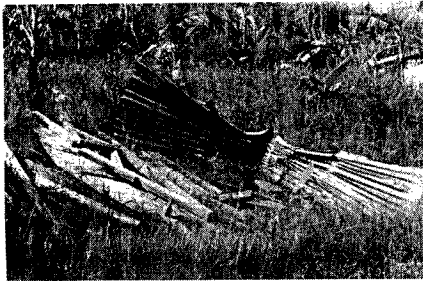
Blown-away and crashed tin roof of a garage, Ozato, OKINAWA.
